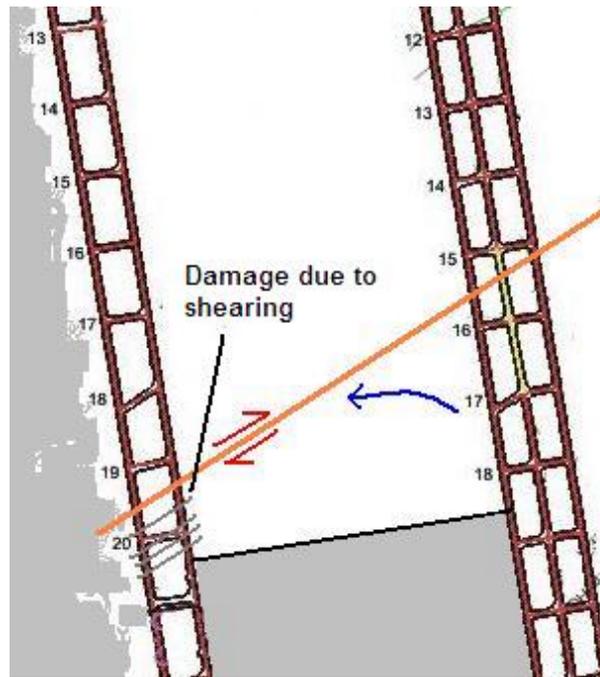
Potential for roof damage due to vertical abutment loading
